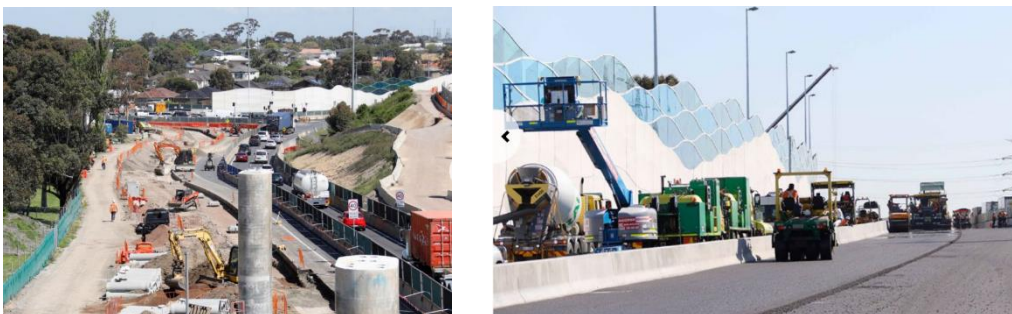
Outbound exit ramp at Melbourne Road and new noise walls
